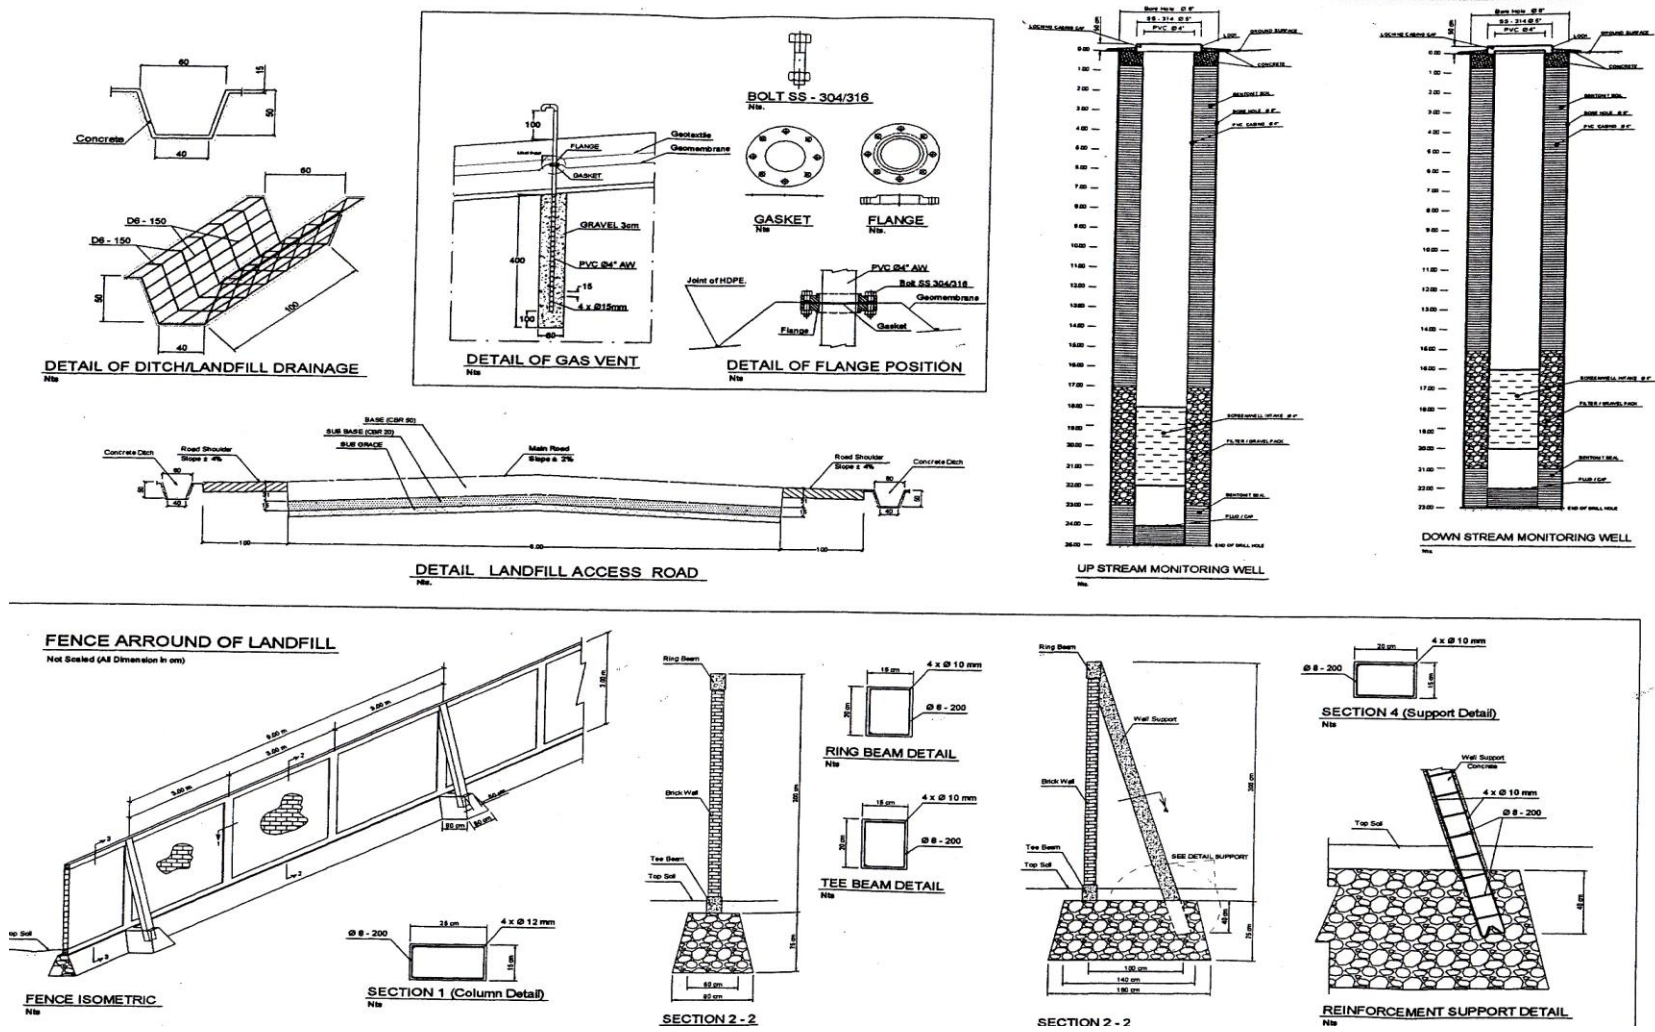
Detail of Ditch Drainage, Gas Vent, Monitoring Well and Fence Around of Landfill
